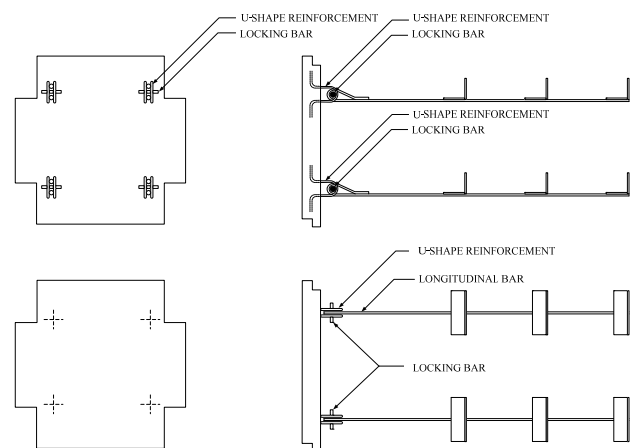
Connection of the bearing reinforcement to wall facing (Horpibulsuk and Niramitkornburee, 2010)
